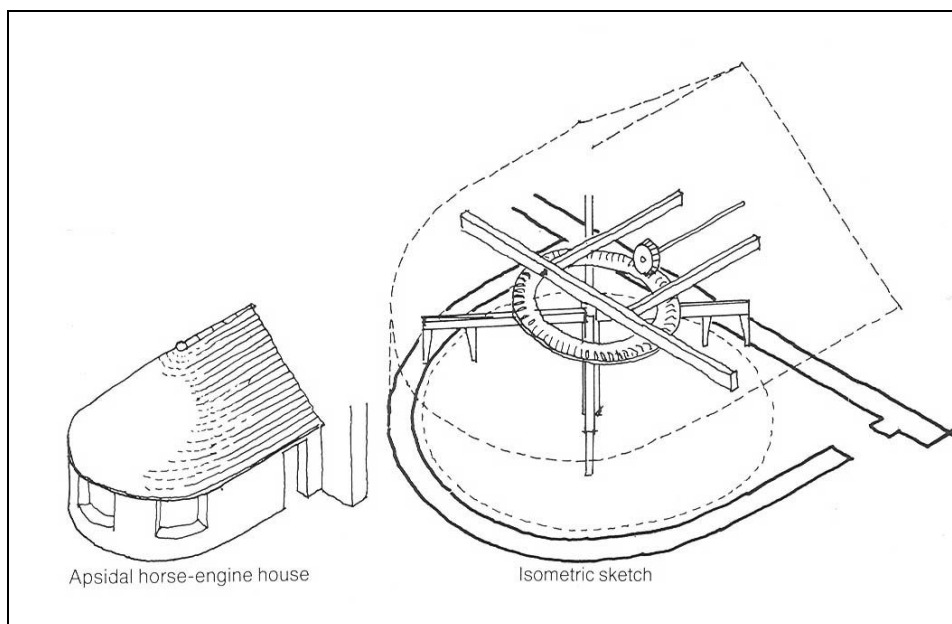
Sketch of an apsidal gin-case and an isometric sketch (after Brunskill 1999)
